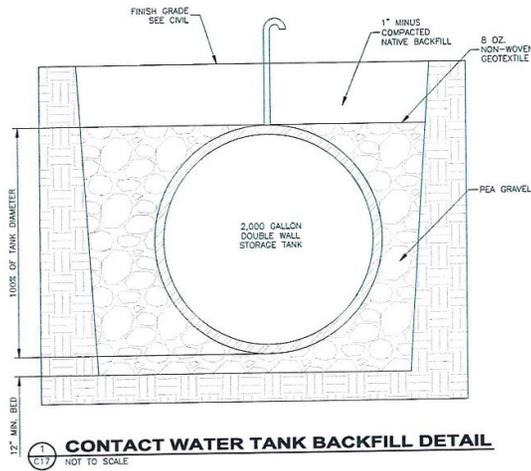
Typical Section – Underground Leachate Storage Tank
